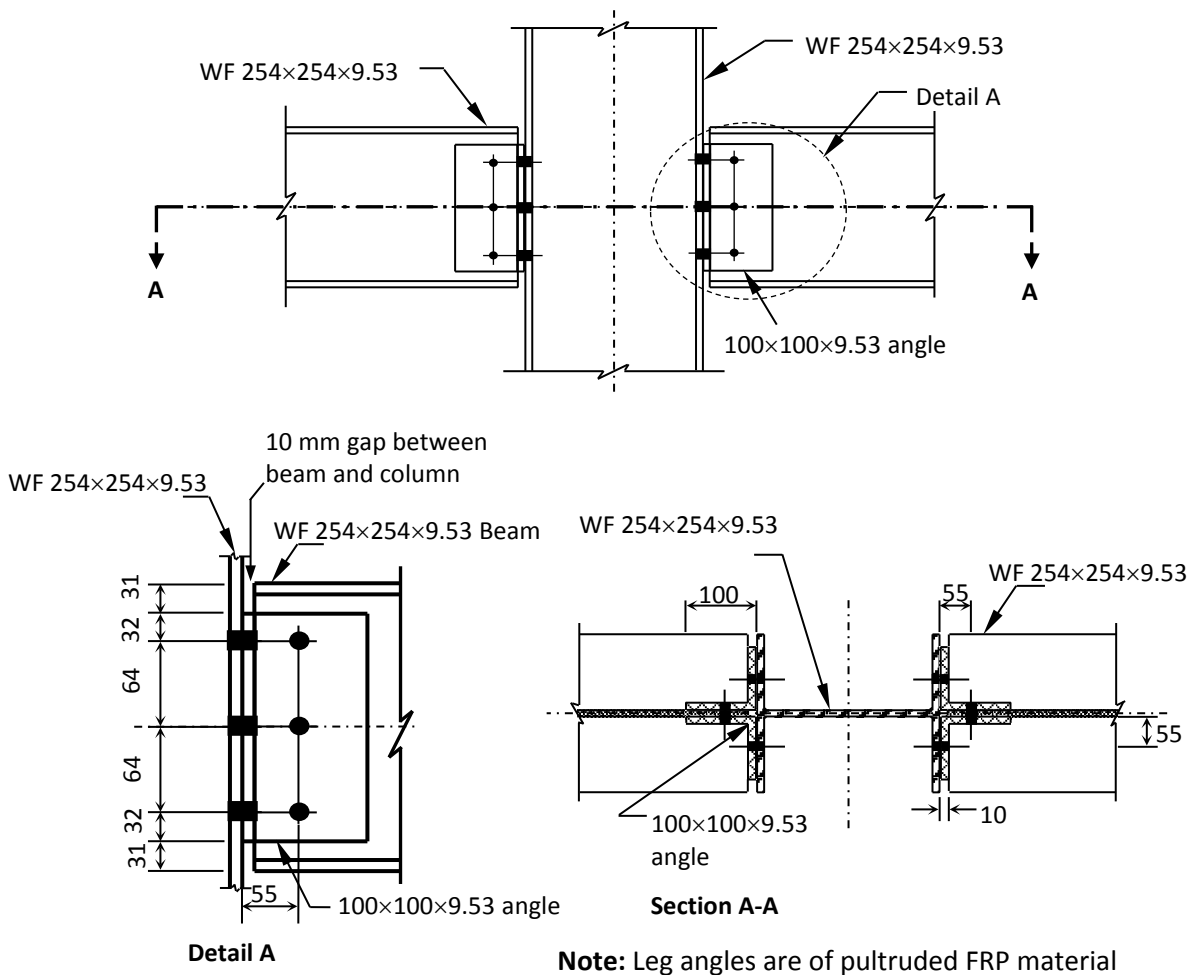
Connection details for nominally pinned beam-to-column joint tests (all dimensions are in mm), adapted from [Fig. 1].
